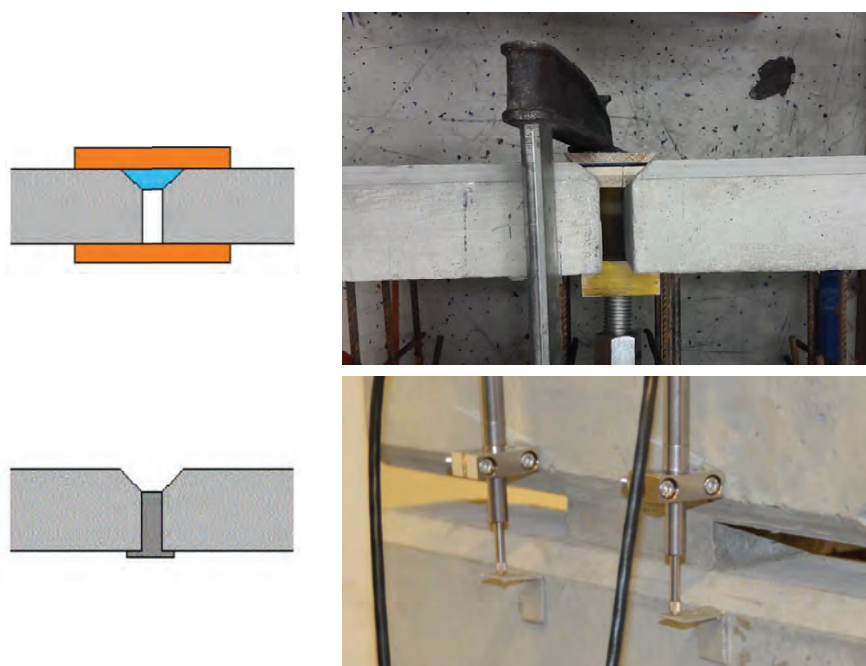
Joint design with joint inlay placed between the chamfers
